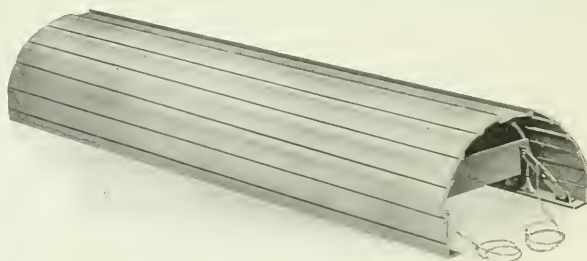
FIG. II. CULVERT MOLD ASSEMBLED READY FOR USE.
